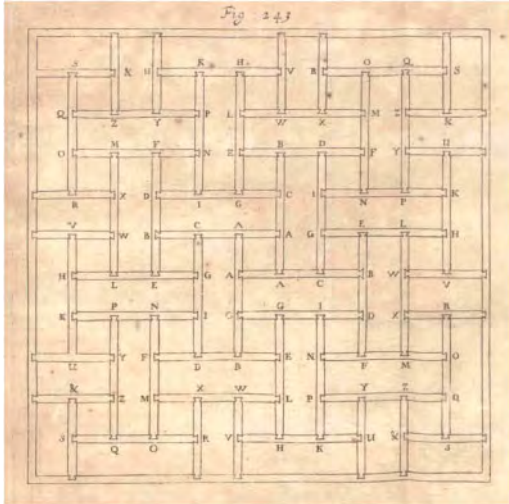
Drawing by Wallis (1670) of a floor with short beams. Alternating clockwise and counter-clockwise modules, the surface of the floor is subdivided into square and rectangular areas, and the beams on the perimeter are shorter than those of the internal parts of the floor.
